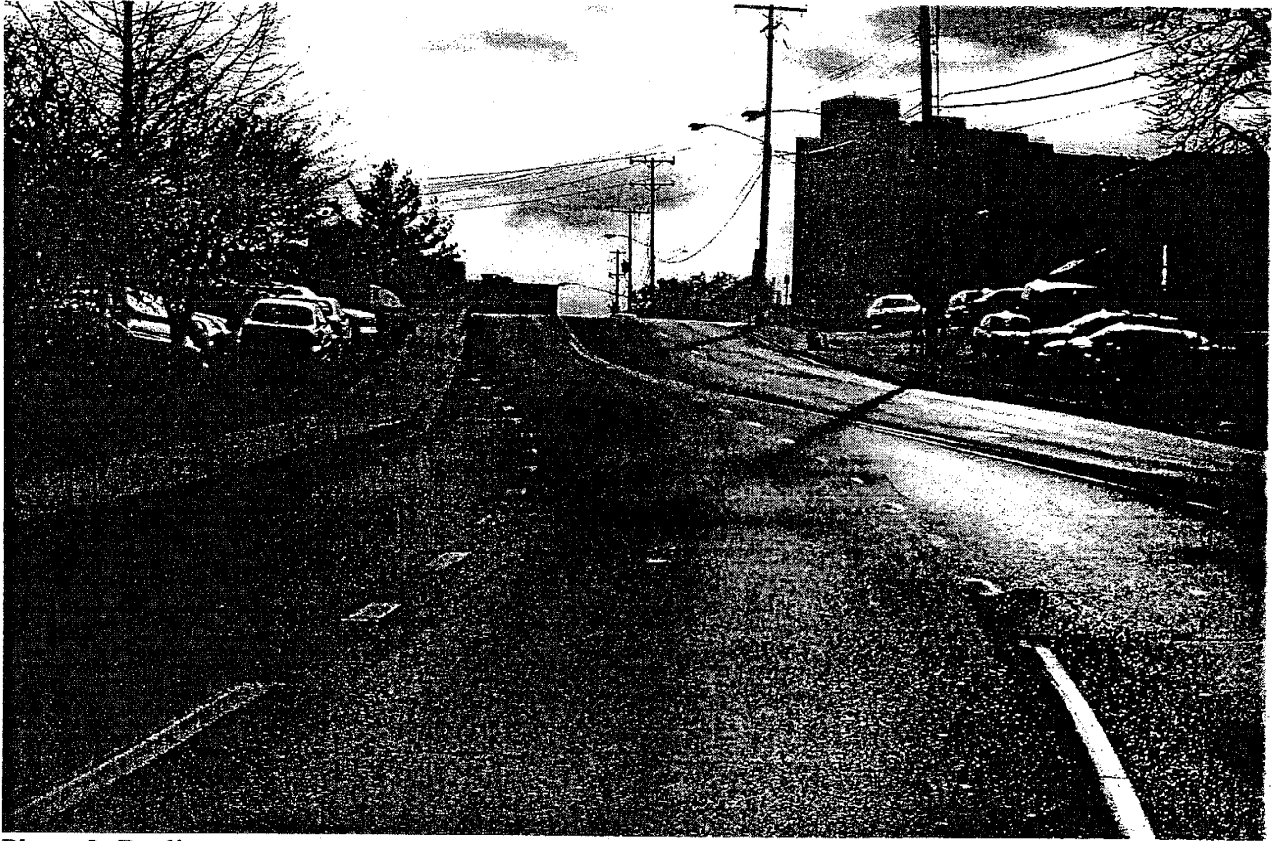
Burlington Avenue (MD 410) westbound from intersection with Fenton Street.
